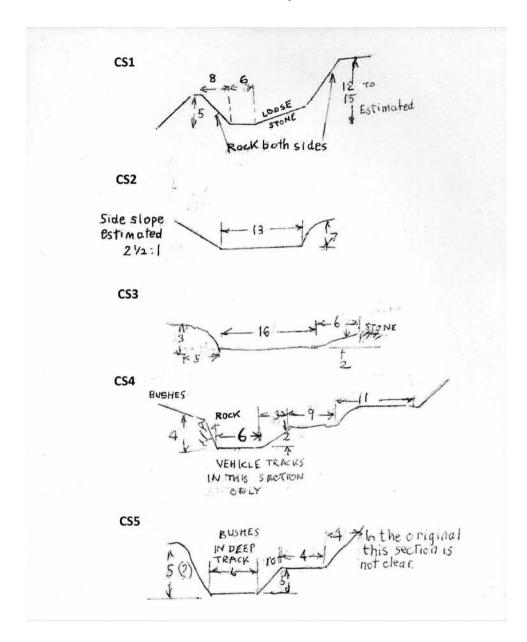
Nine stiles walk – cross sections 1–5 (not to scale).
